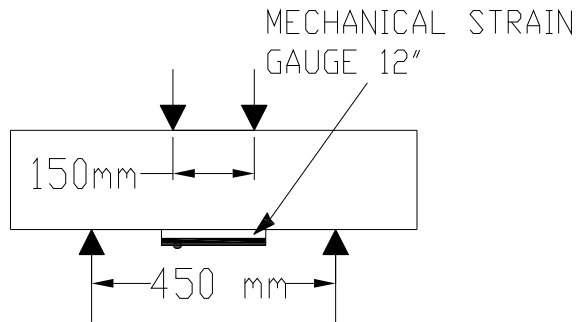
Loading Arrangement of Rapid Load Beam Test
